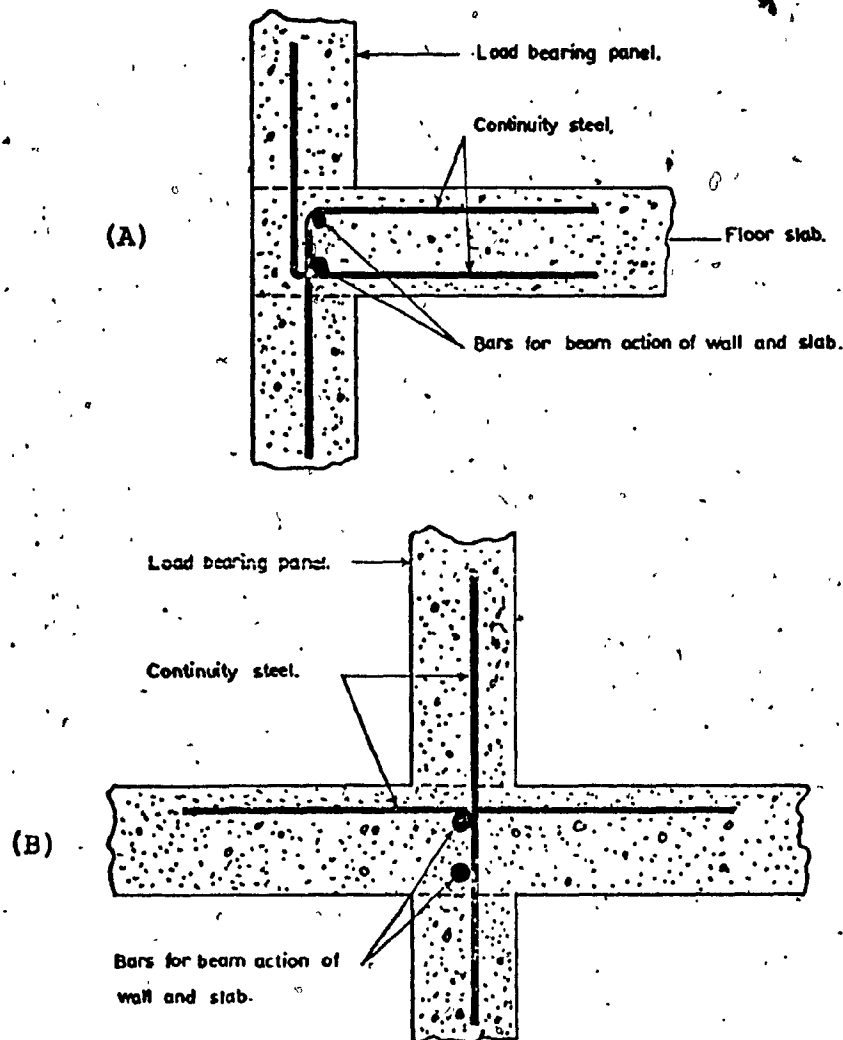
Ductile Connections Showing Continuity Steel.
